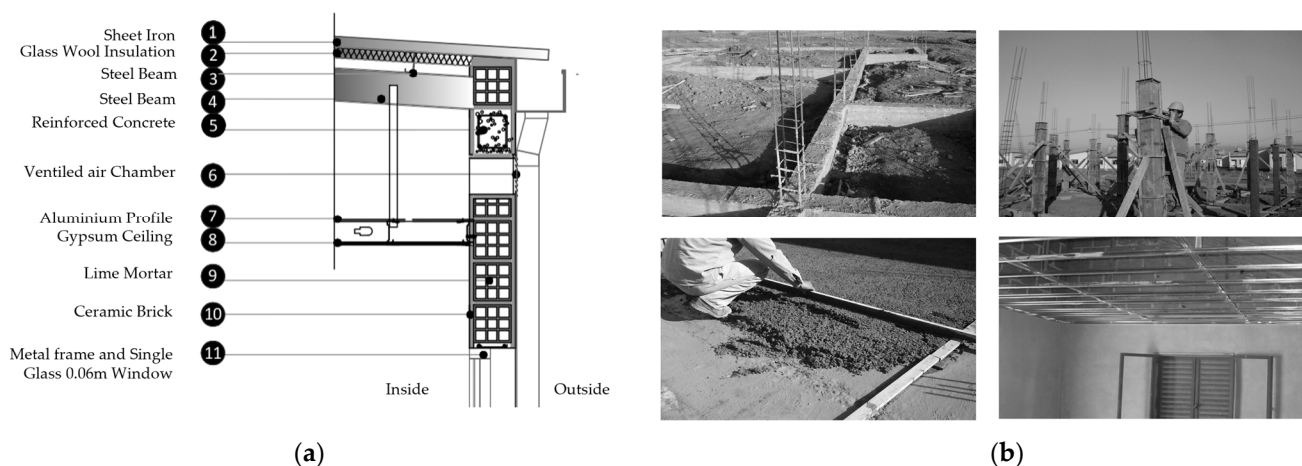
Construction type: (a) constructive detail and (b) construction technology.
